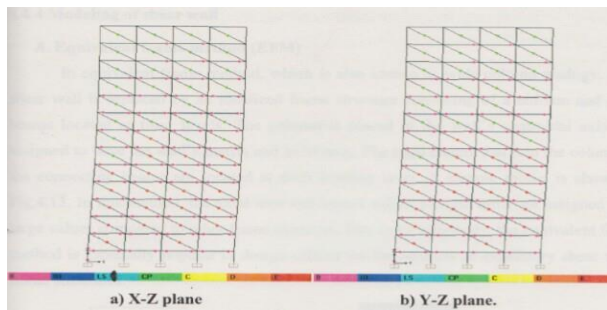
Hinge formation of Ground level and eighth floor retrofitted with infill wall
